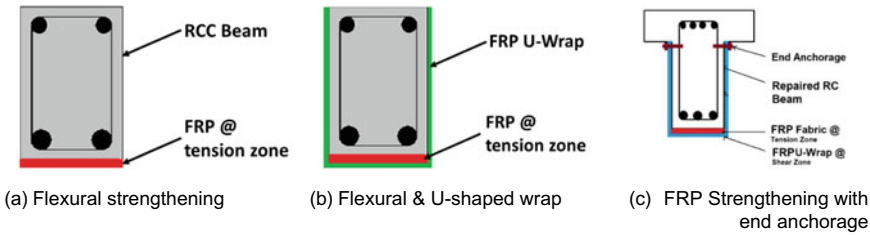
Typical FRP strengthening and anchorage in RC beams
